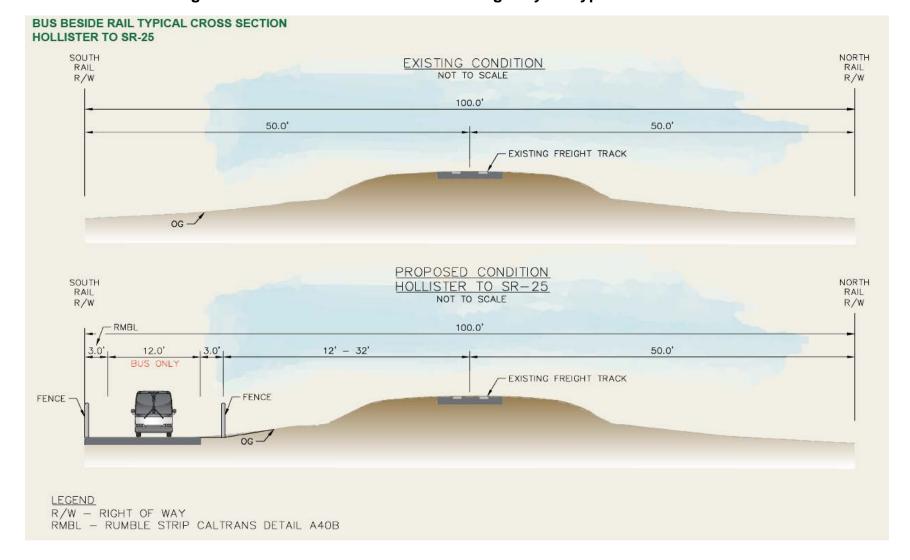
Bus-Beside-Rail Hollister to Highway-25 Typical Cross Section
